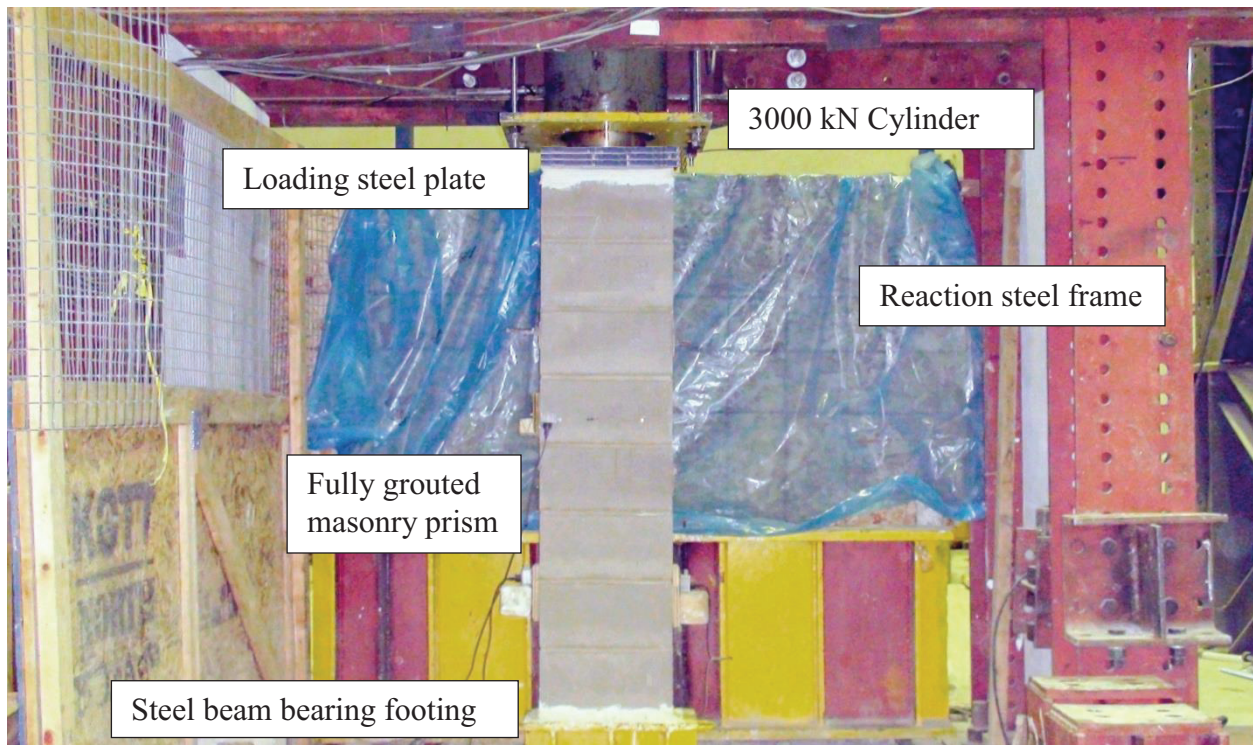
Typical uniaxial compression test setup for masonry prisms
